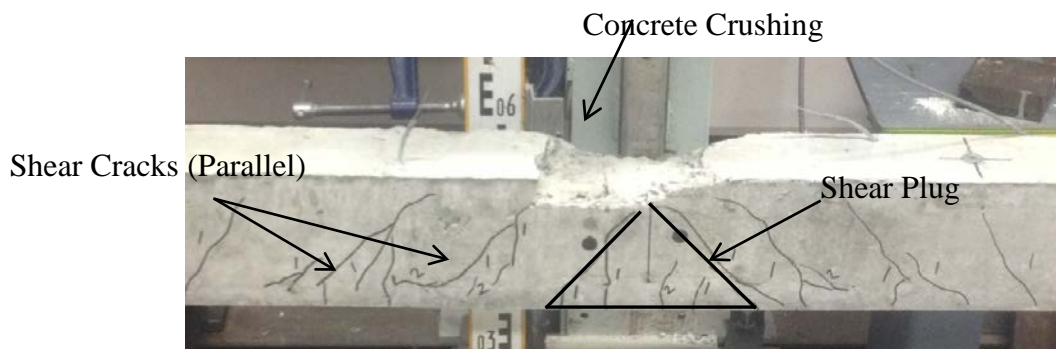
Failure Mode of Beam 80-#3HM-1.0-I under Impact Loading
